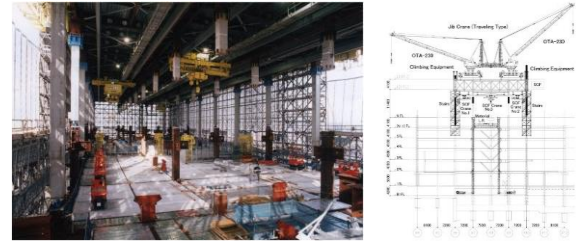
Onsite Construction Factory (Source: Chu et al., 2013)
